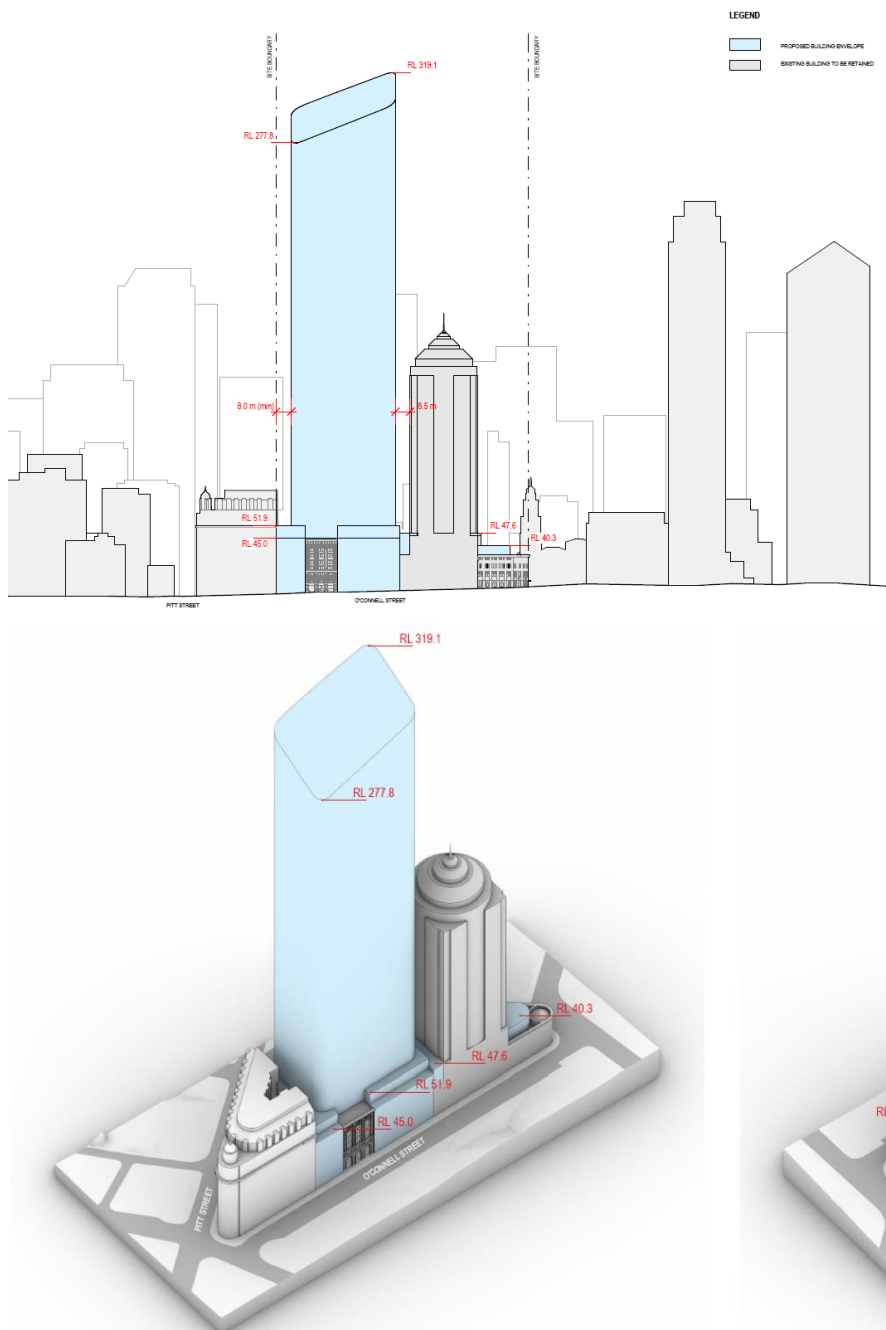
and Figure 21 illustrates extracts of the proposed tower envelope plans.
